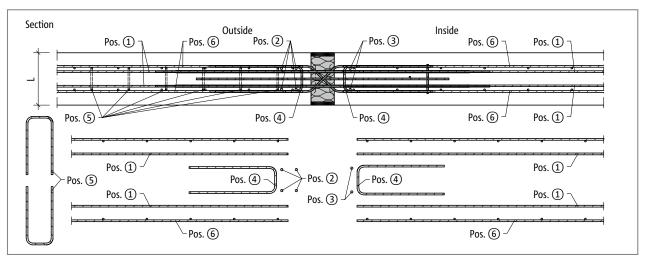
Schöck Isokorb® T type W: On site reinforcement (layout)
